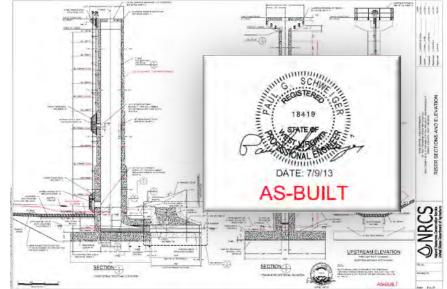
New Creek Site 14 Sample As-built Drawings. Paul Schweiger, a WV Professional Engineer and our proposed Project Manager, stamped the as-built drawings for NRCS WV's New Creek Site 14 Dam project.
